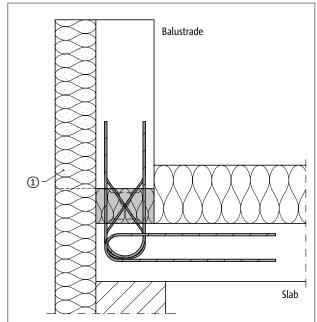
Schöck Isokorb® XT type A: Connection to a parapet (type A-MM1-VV1)
